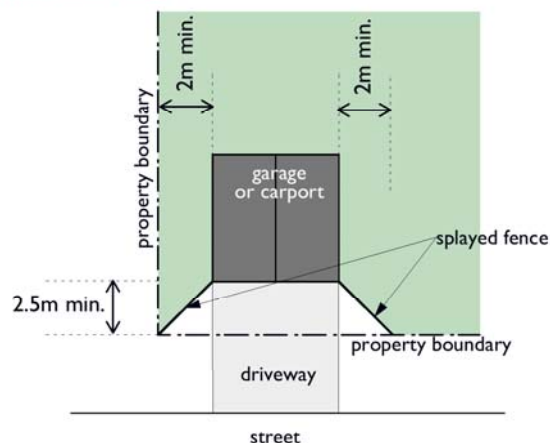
Illustrative plan showing the location of car parking structures and how fences are to be splayed to provide adequate sight lines in situations where fences would otherwise obstruct views.
